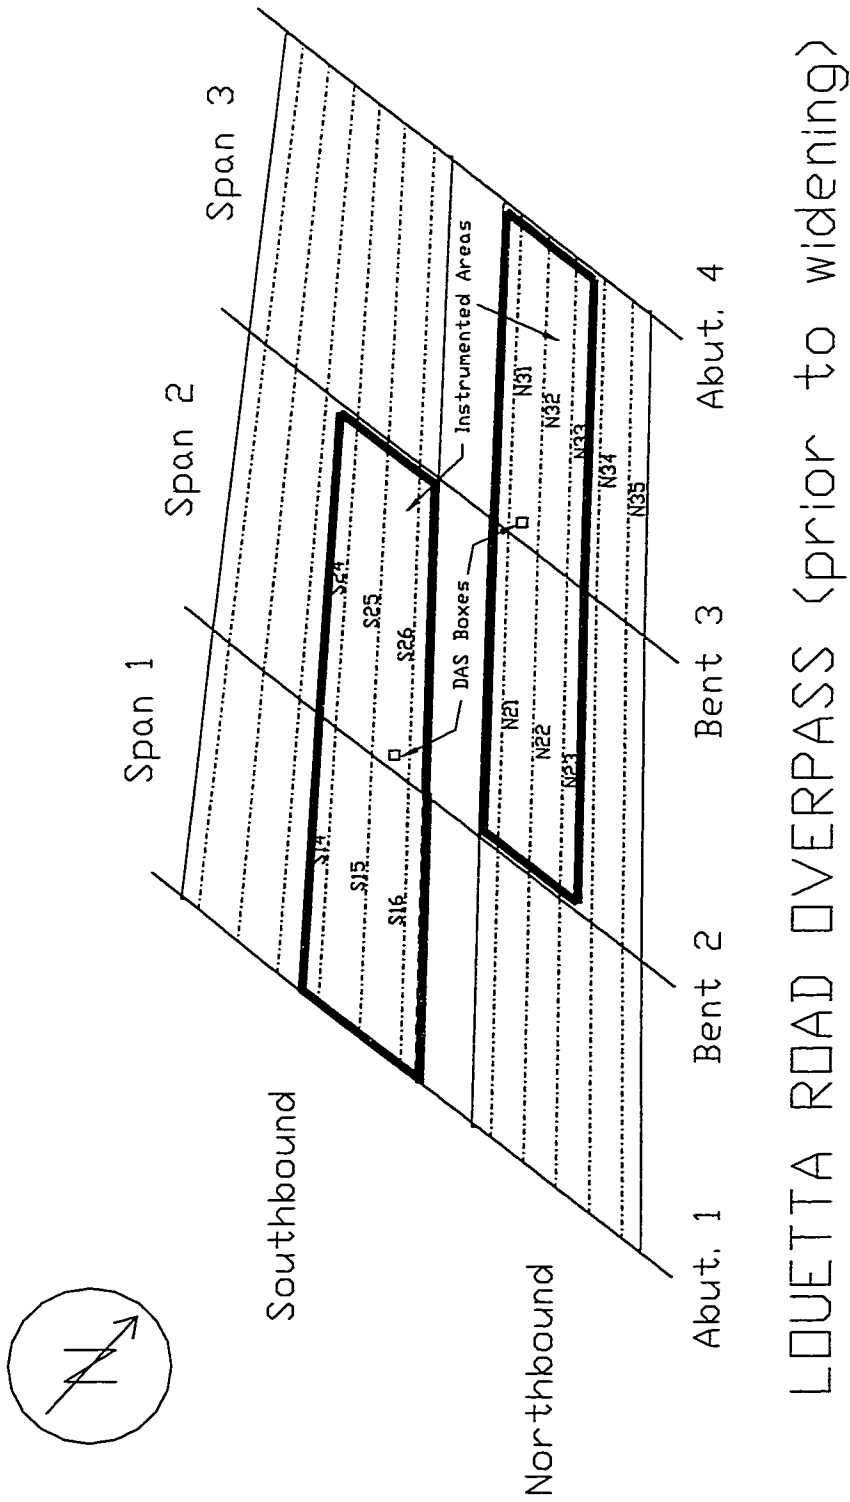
Instrumented Areas of the Louetta Road Overpass
